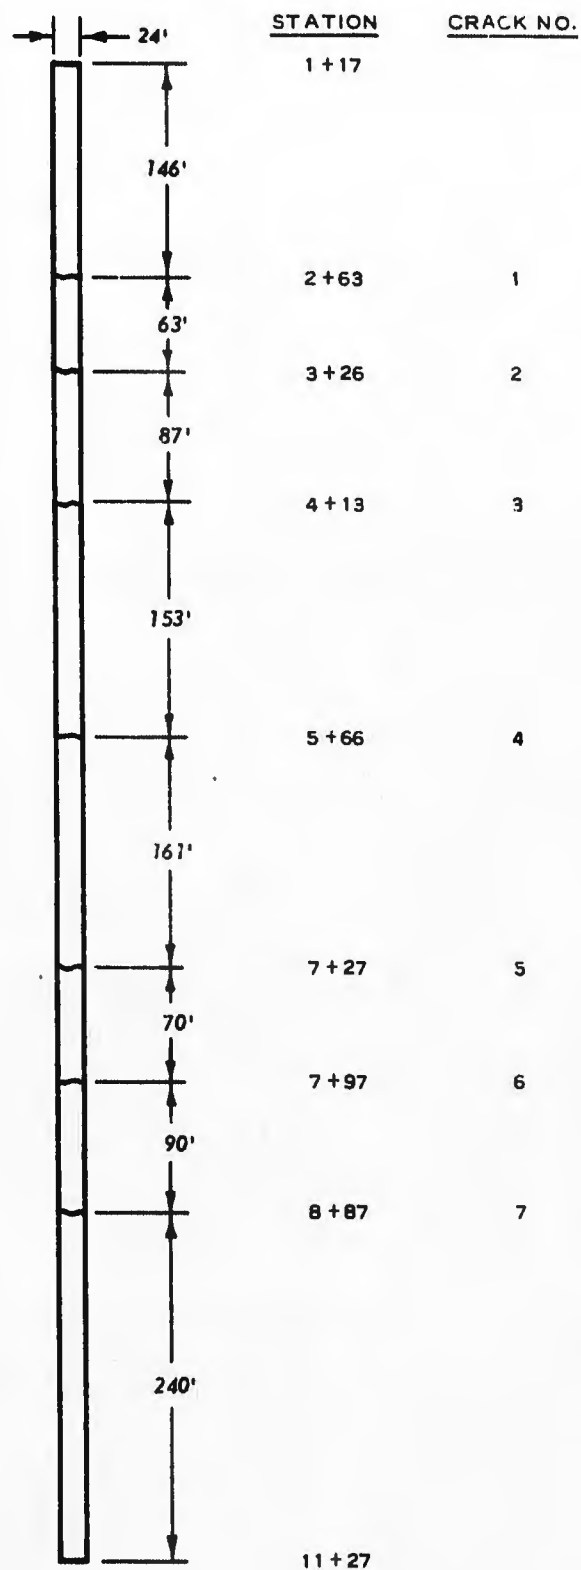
Crack development in the WES fibrous concrete roadway as of December 1973
